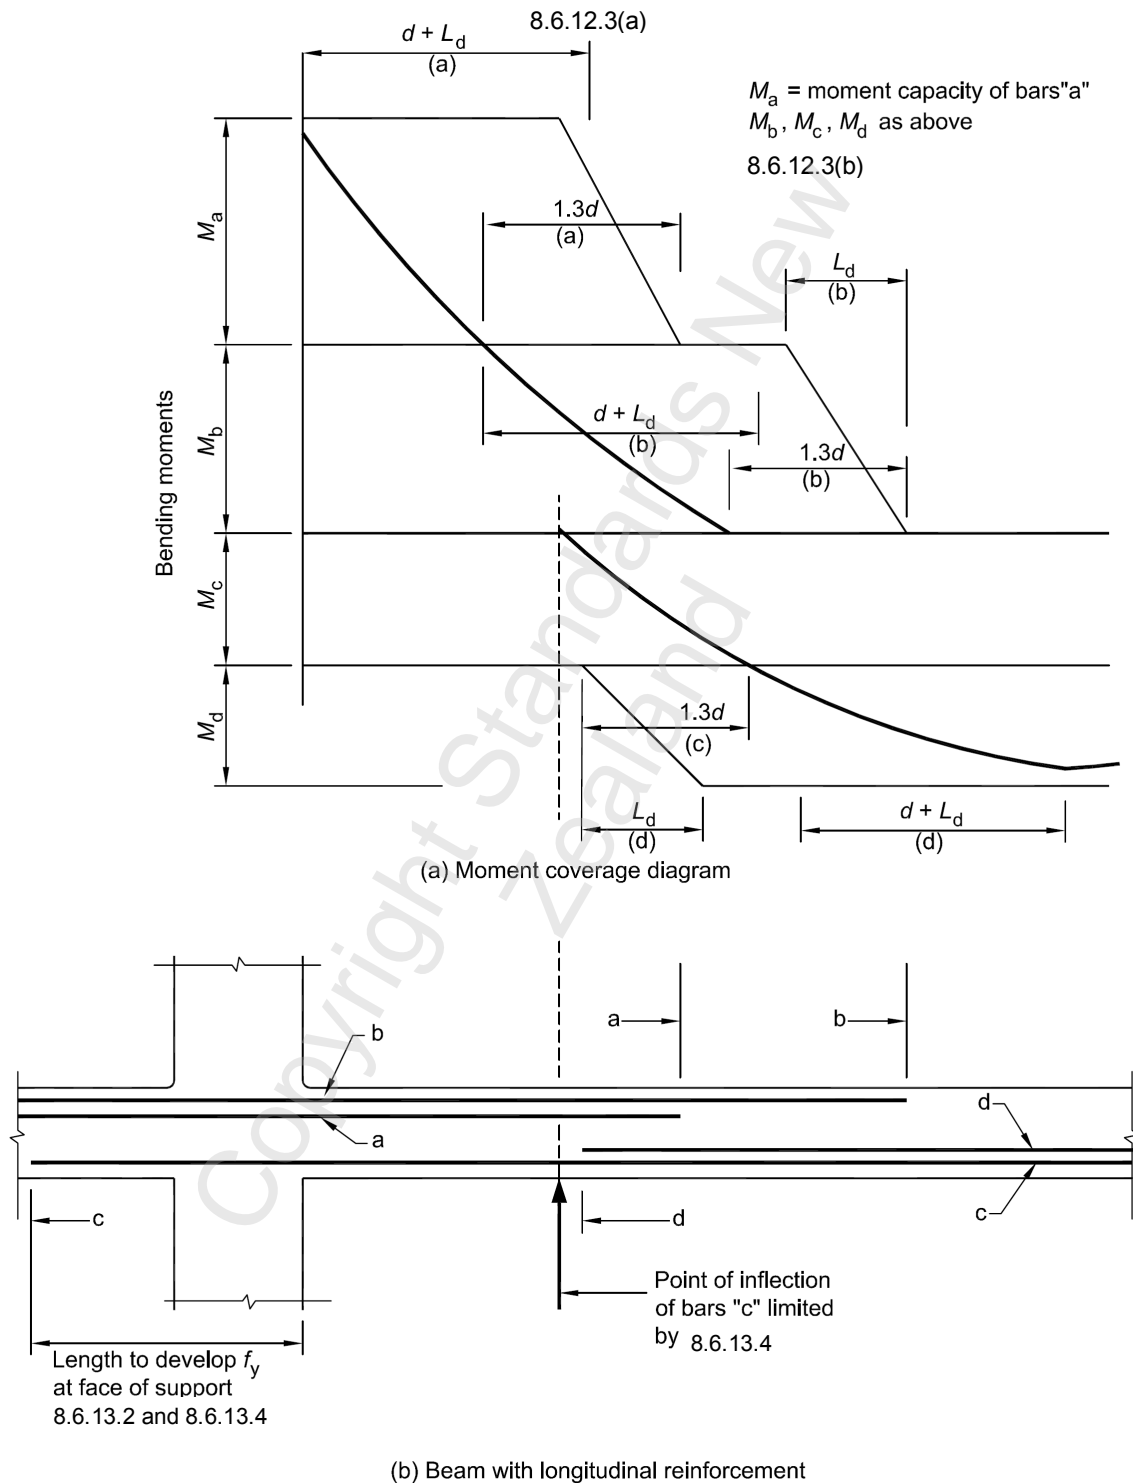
Development of flexural reinforcement in a typical continuous beam
